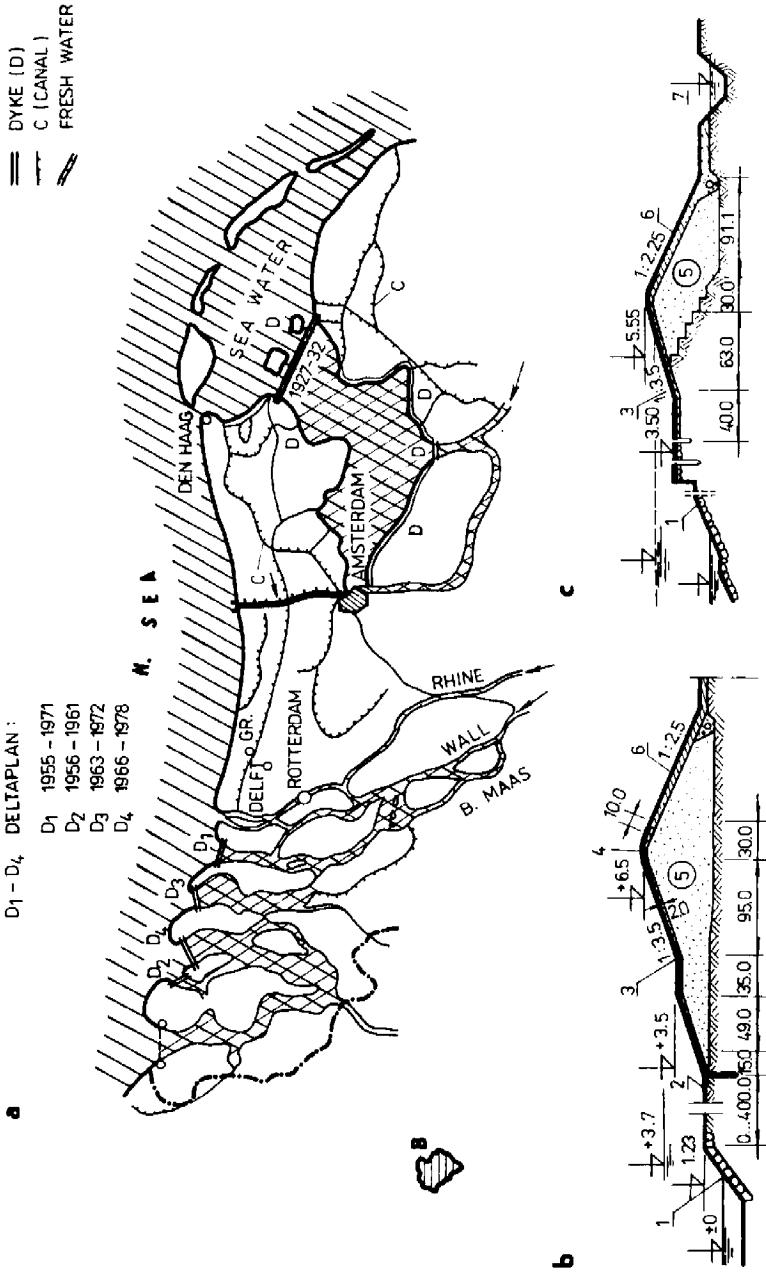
Embankments along coasts in Holland, a — location of the dykes (D) protecting the land, b — cross-section at St Jacob, c — van Pallandpolder; 1 — stone-pitches (pitched with asphalt), 2 — rip-rap stones with asphalt penetration, 3 — asphaltic concrete (10 cm), 4 — bitumen with sand, 5 — sand, 6 — clay layer (80 cm thick), 7 — water canal.
